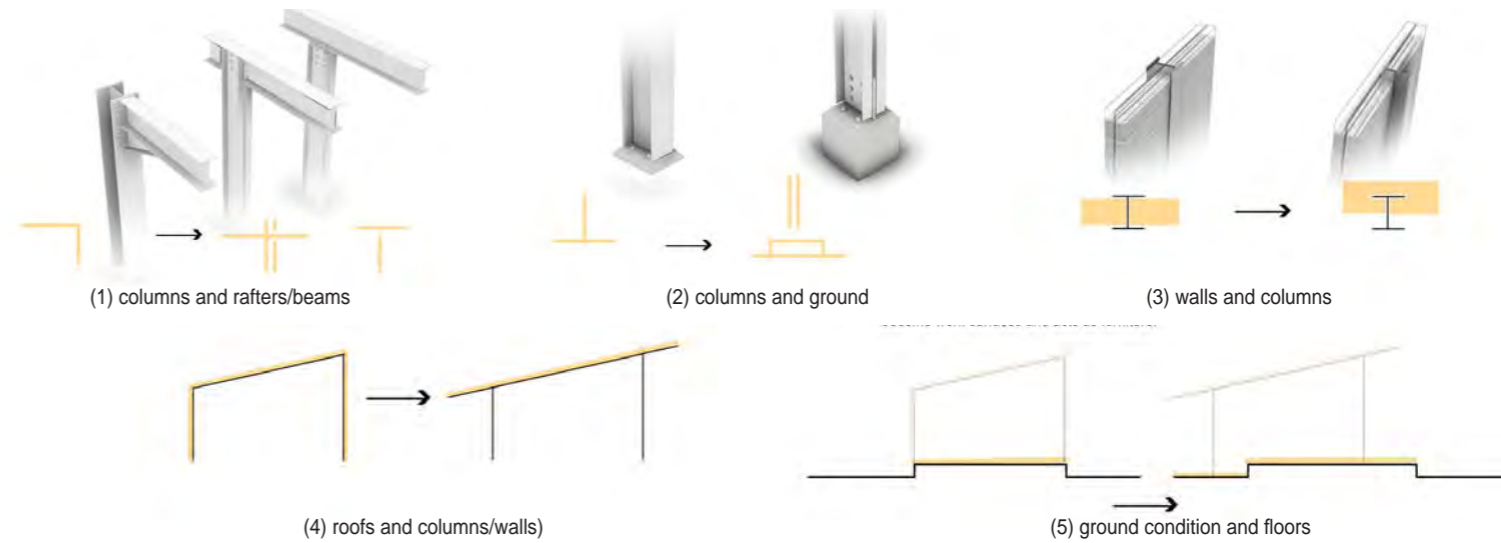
theory on how to treat connections and building elements (Author, 2014)
